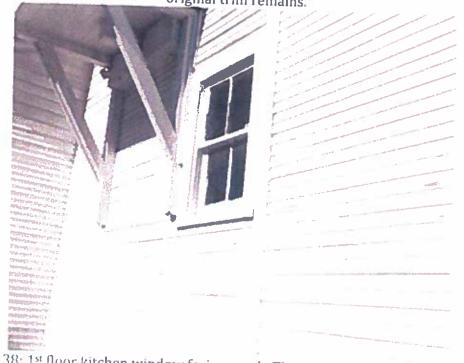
1st floor kitchen window facing south. The window has been replaced but some original trim remains.
